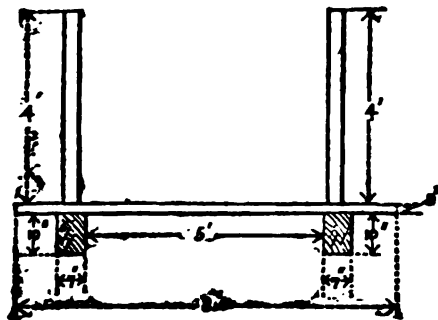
is a cross section of a simple wooden bridge, for purposes of calculating the dimensions of its constituent parts. a, a are the longitudinal beams, b the planking which constitutes the roadway, r, r the railing. (Scale = $\frac{1}{4}$ in.)
